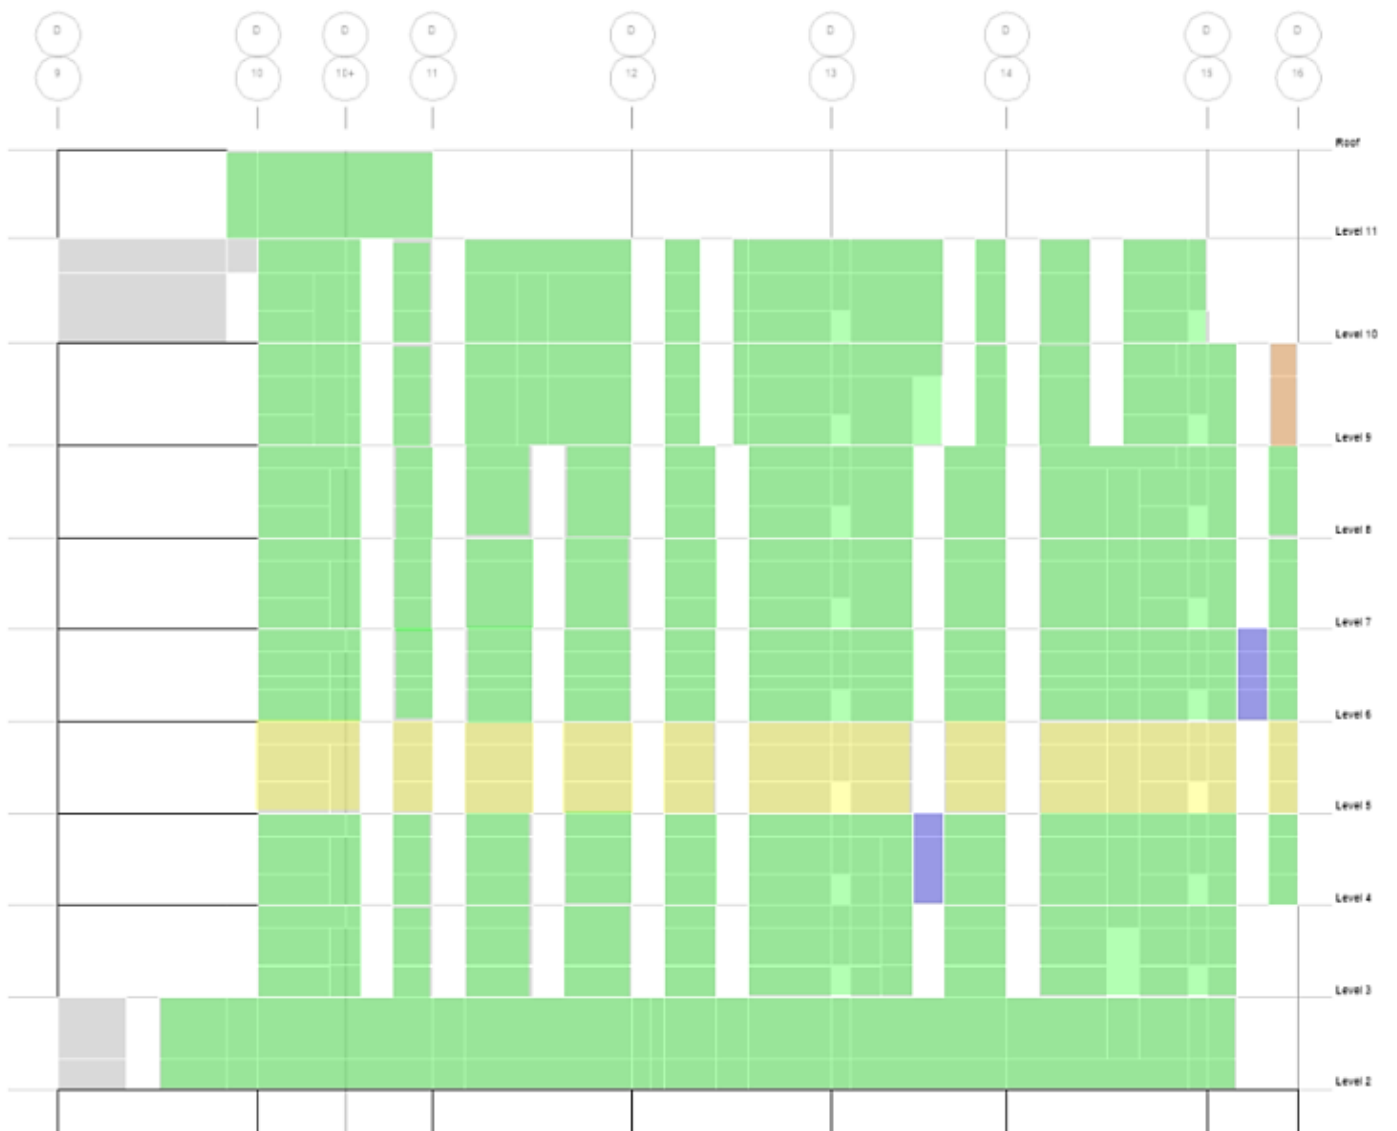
, Gridline D Longitudinal Direction Wall – South Structure
